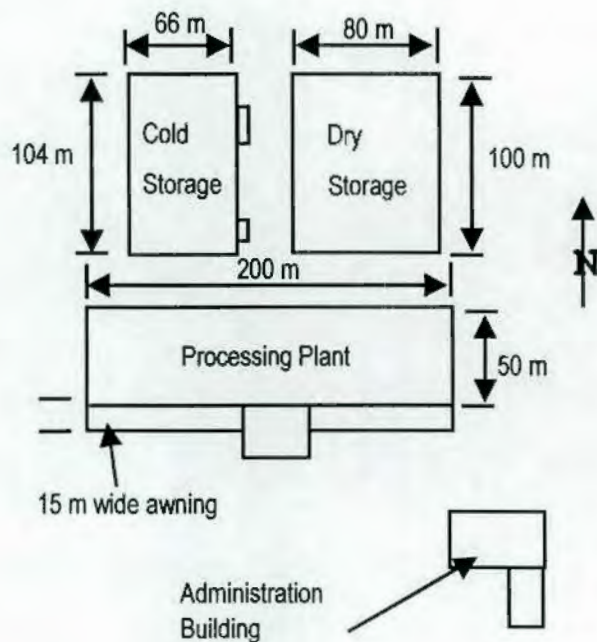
Site Plan of the Proposed Development. (Not to Scale.)
